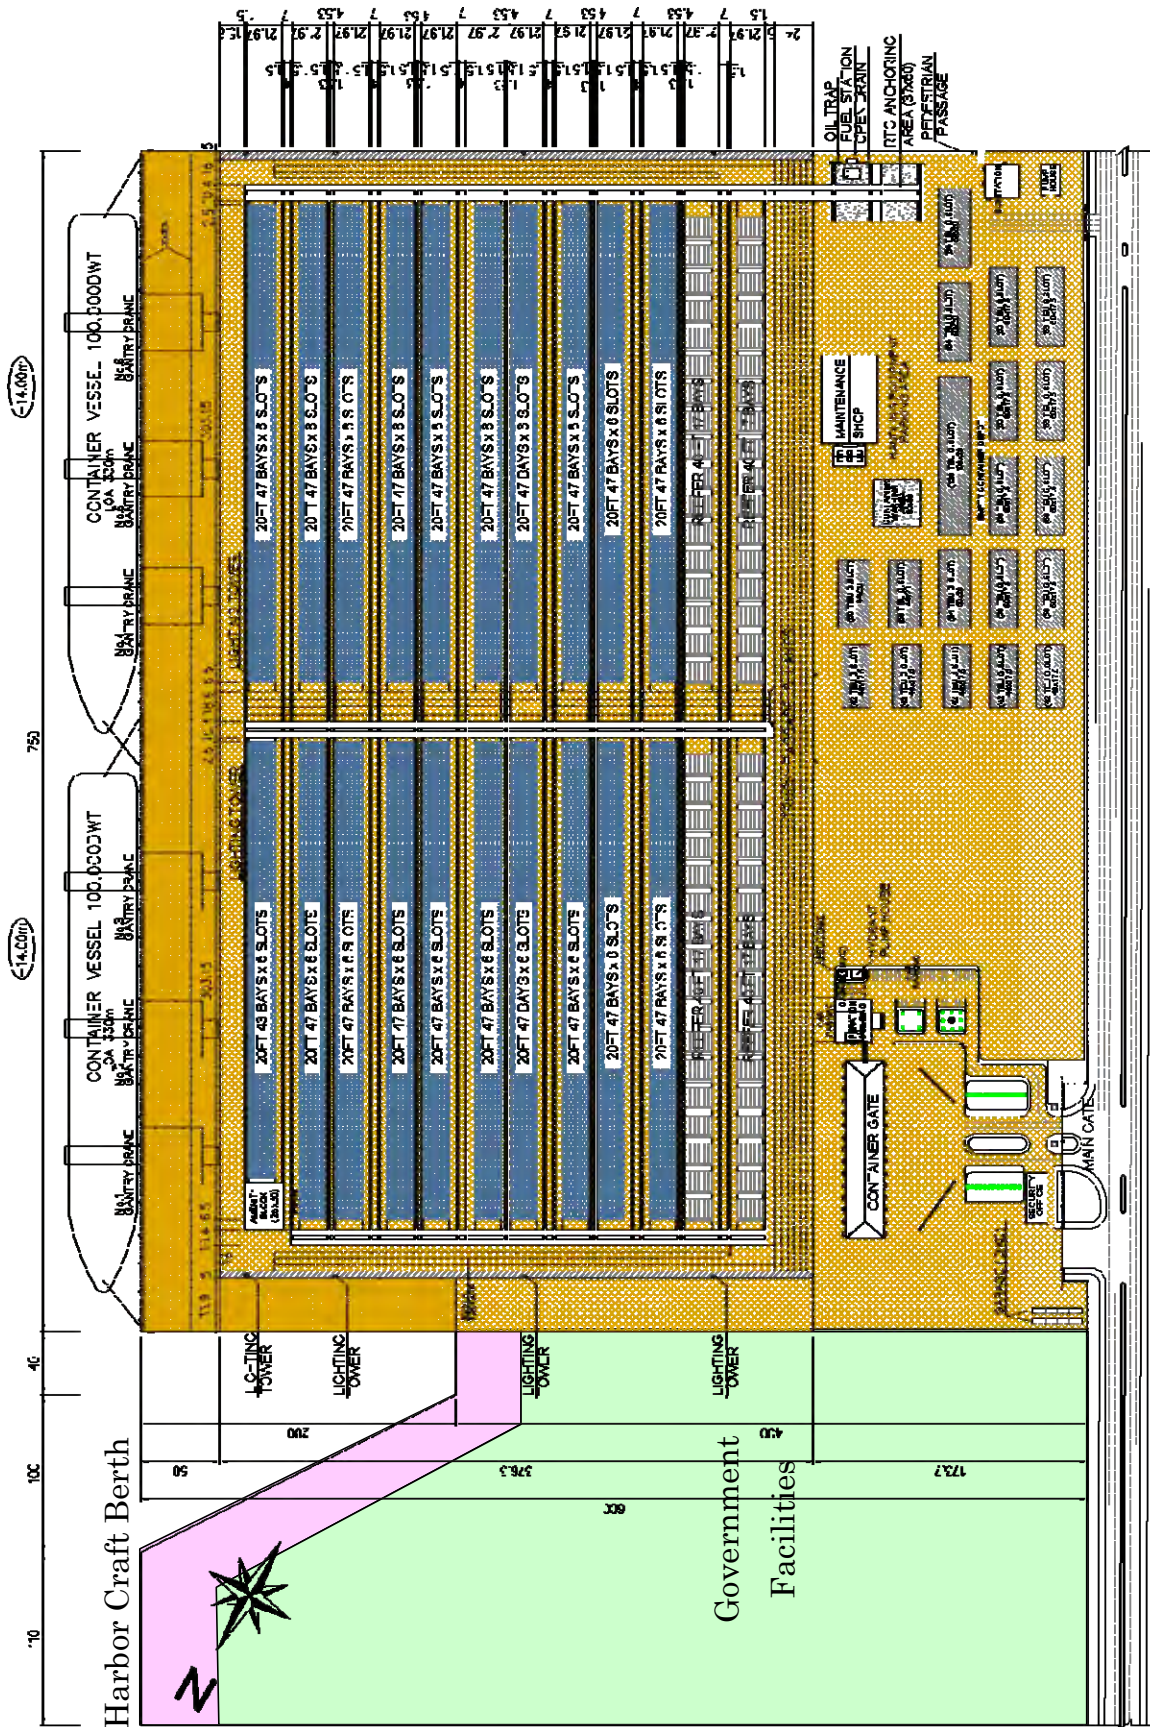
Layout of Container Terminal No.1 & No.2 and Government Facility Area
